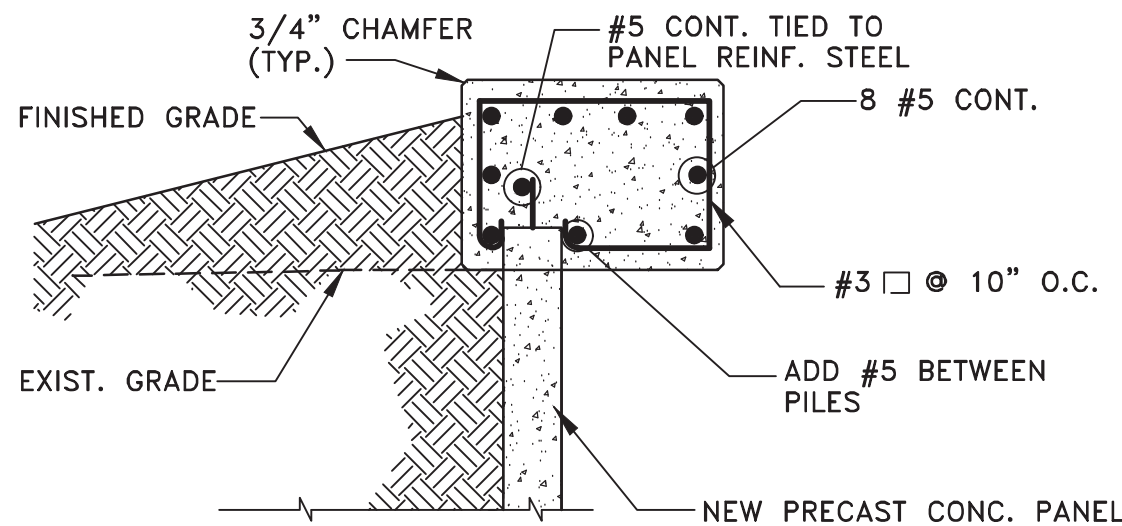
DETAIL: NON-TYPICAL PRECAST CONCRETE PANEL
